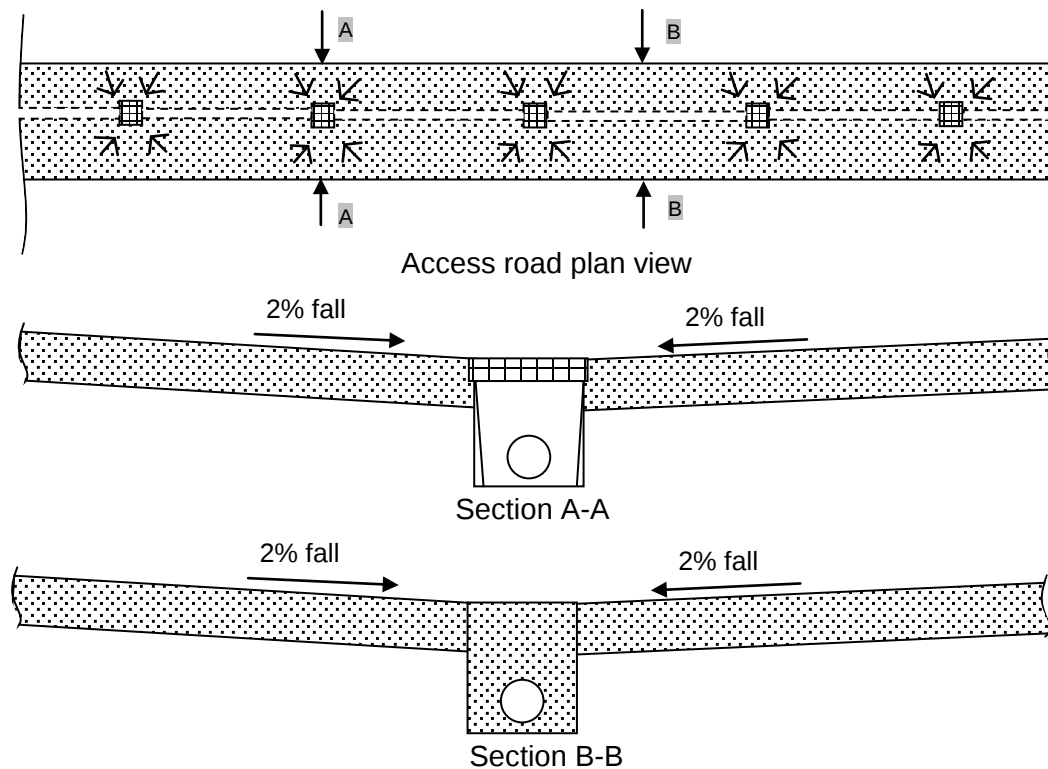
Typical access road drainage layout with interconnected stormwater drainage pits
